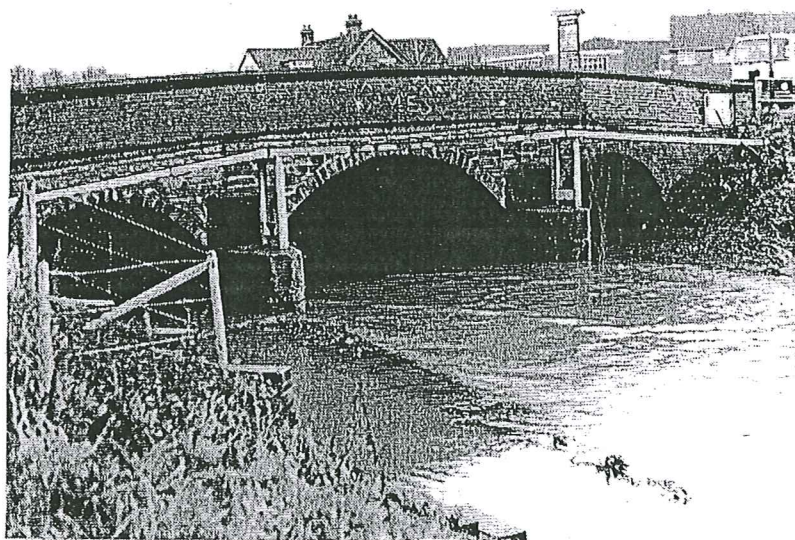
WOLSTON BRIDGE AND AVON MILL BRIDGE
